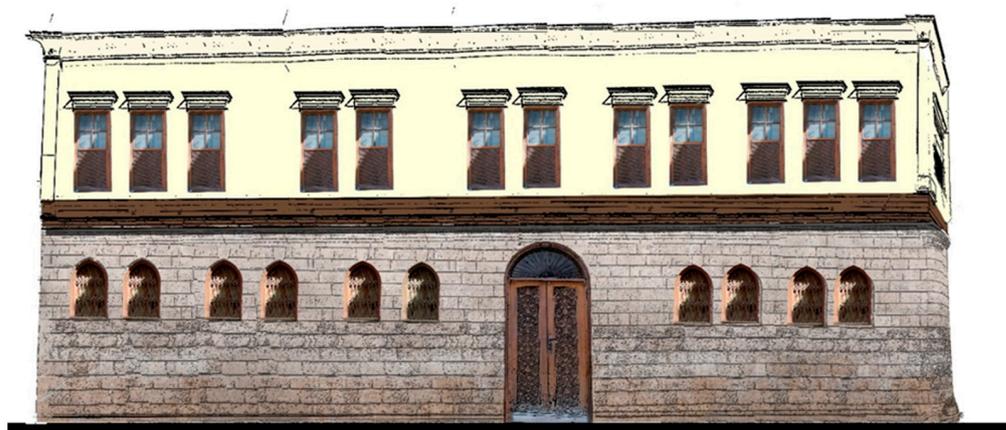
The front view of the façade of Khorazati House overlooking Eldarb Elasar street.
